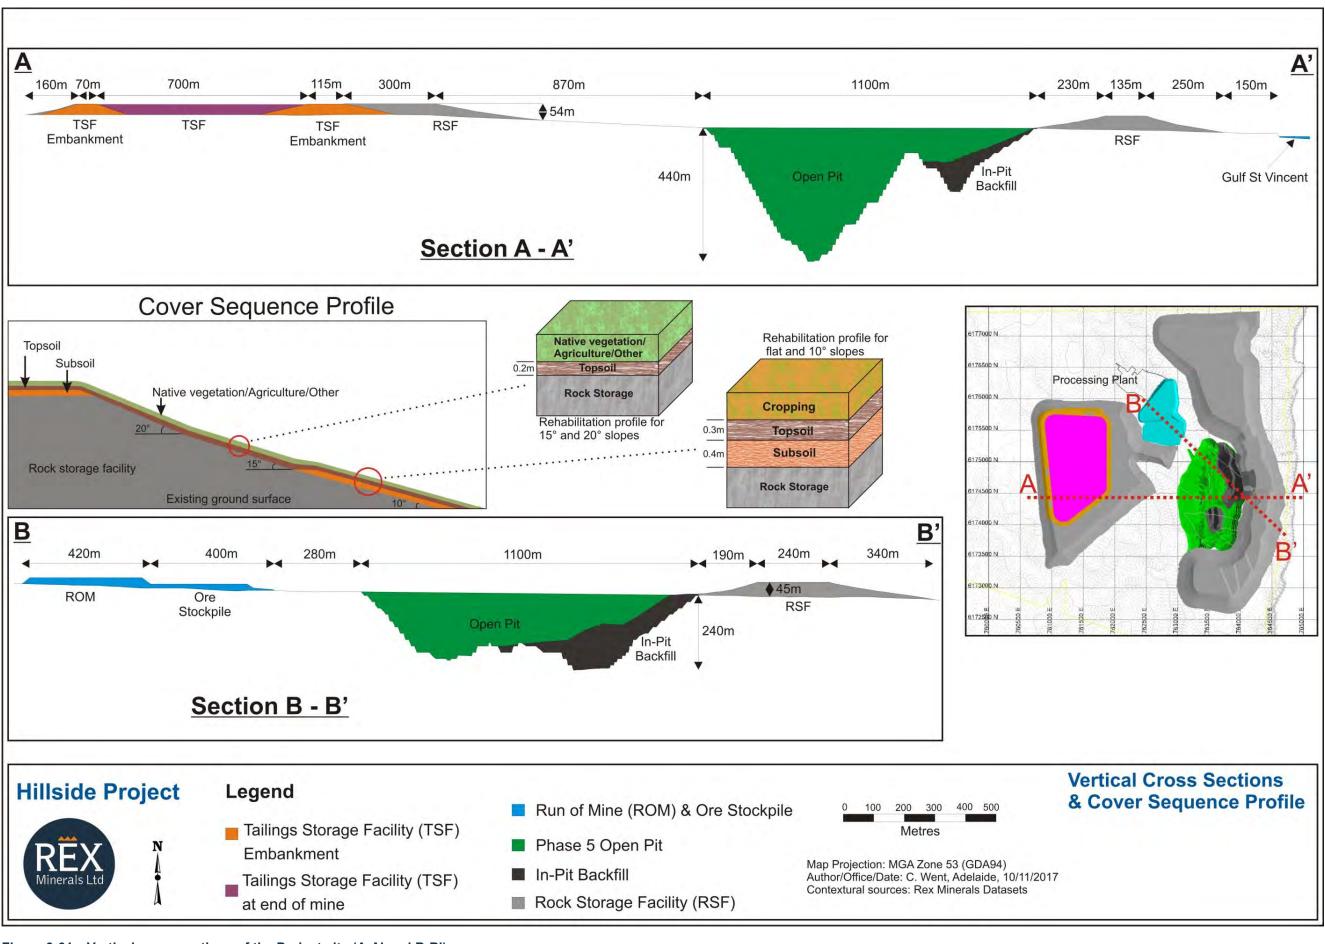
Vertical cross-sections of the Project site (A-A' and B-B')
